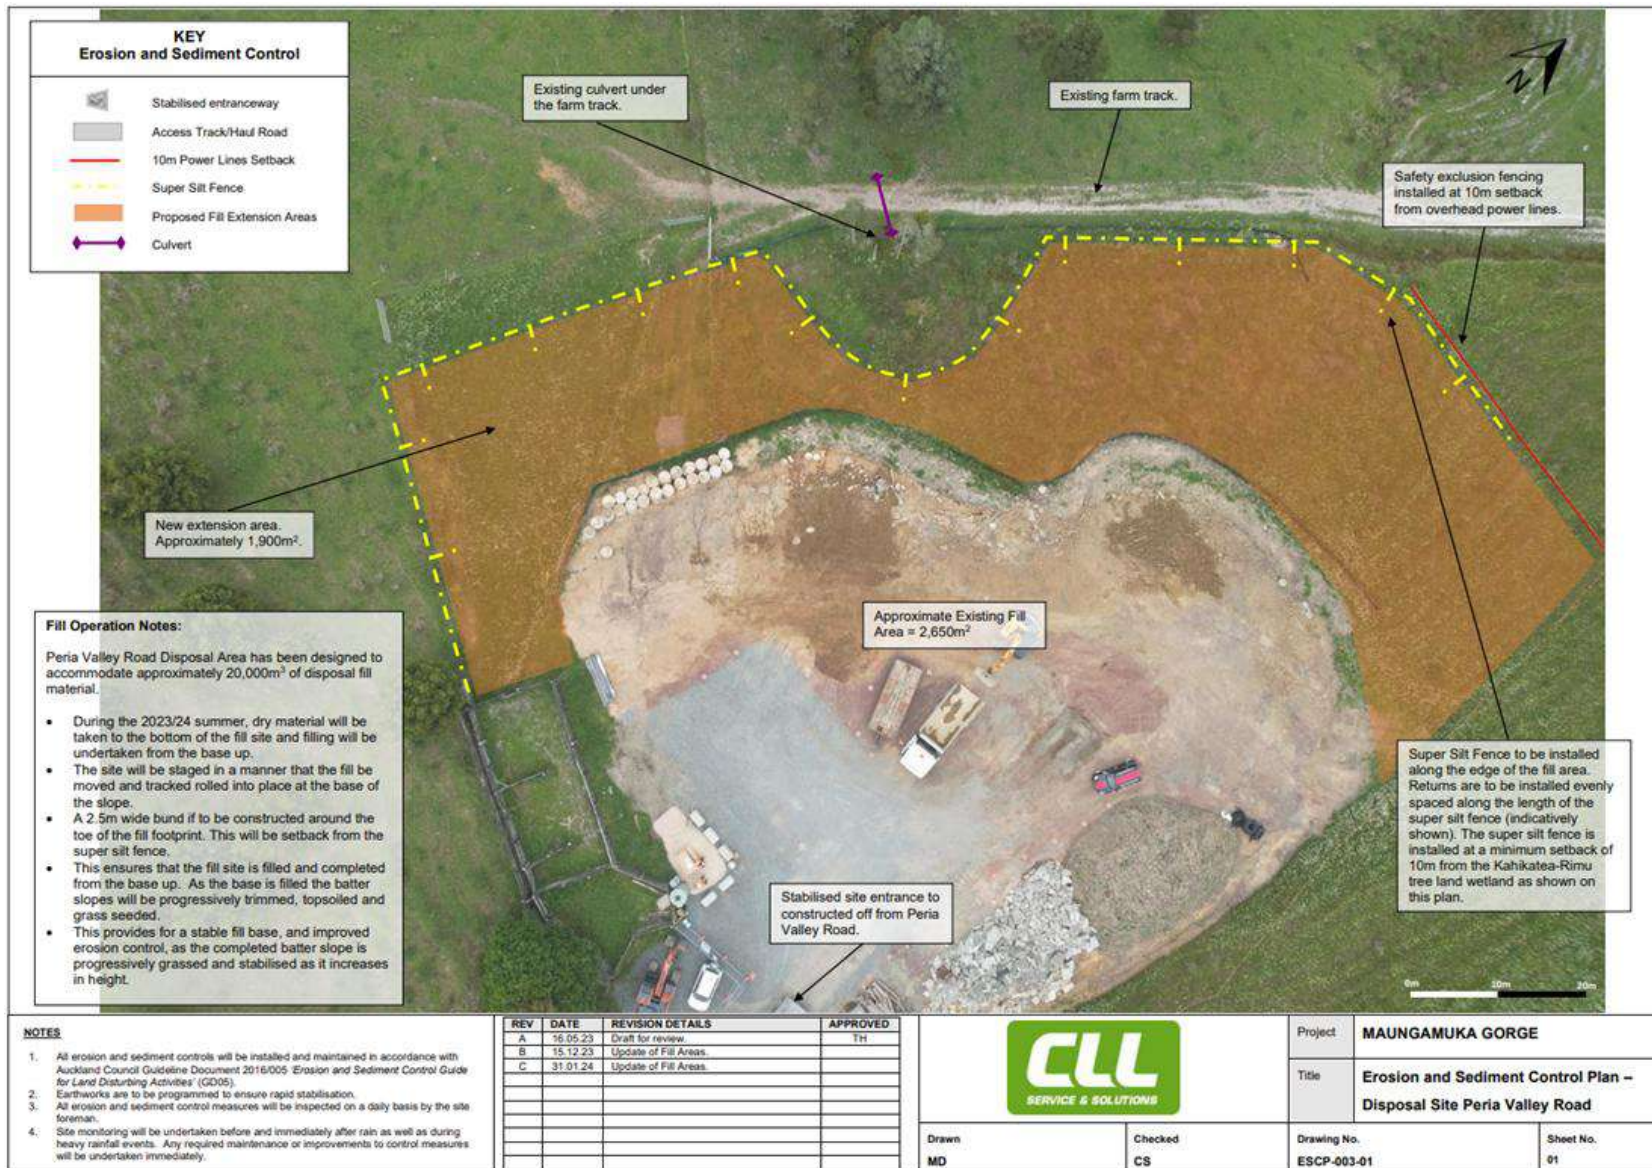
Map and scheme plan of the existing and proposed soil disposal site at 184 Peria Valley Road, Northland.
